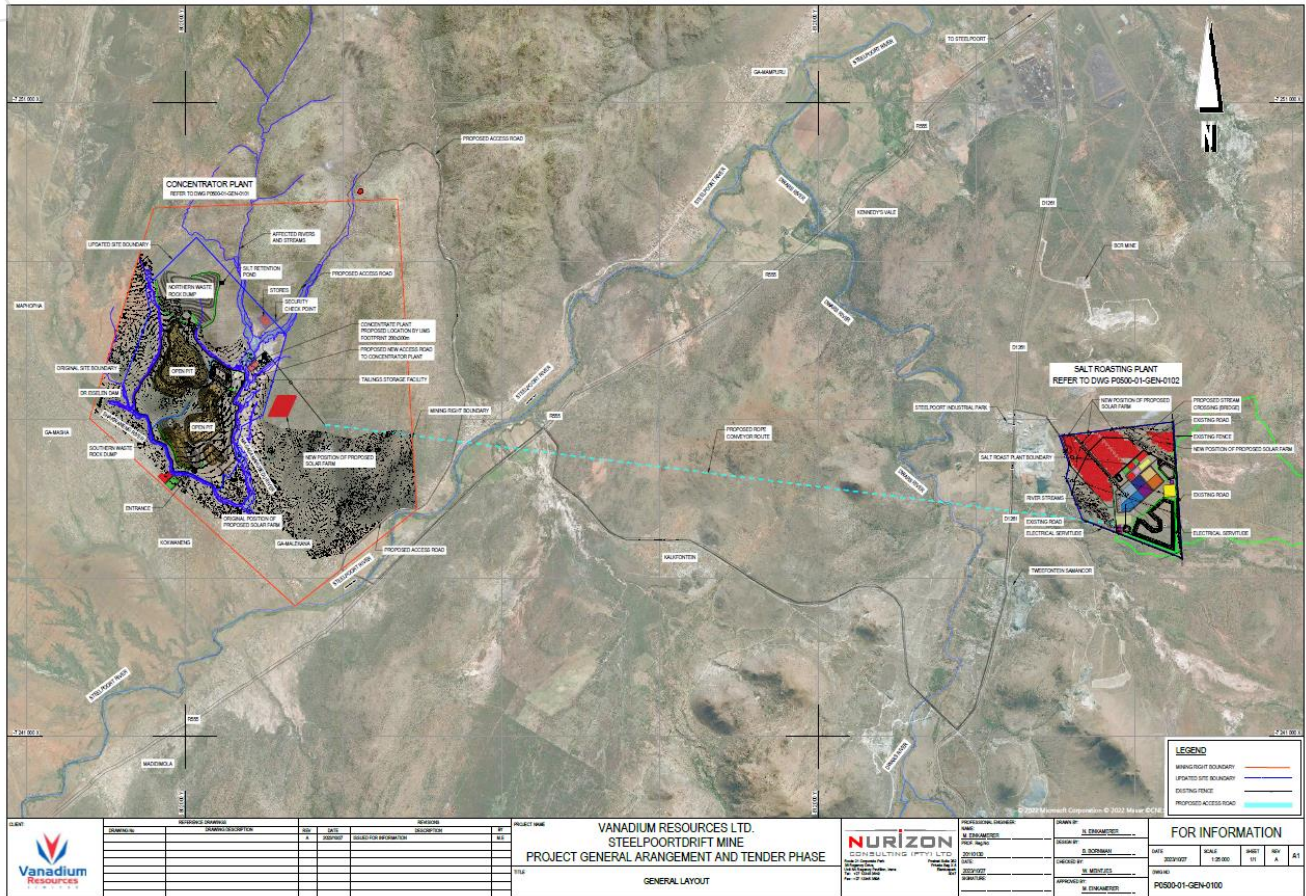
Layout Plan of Steelpoortdrift and Tweefontein
